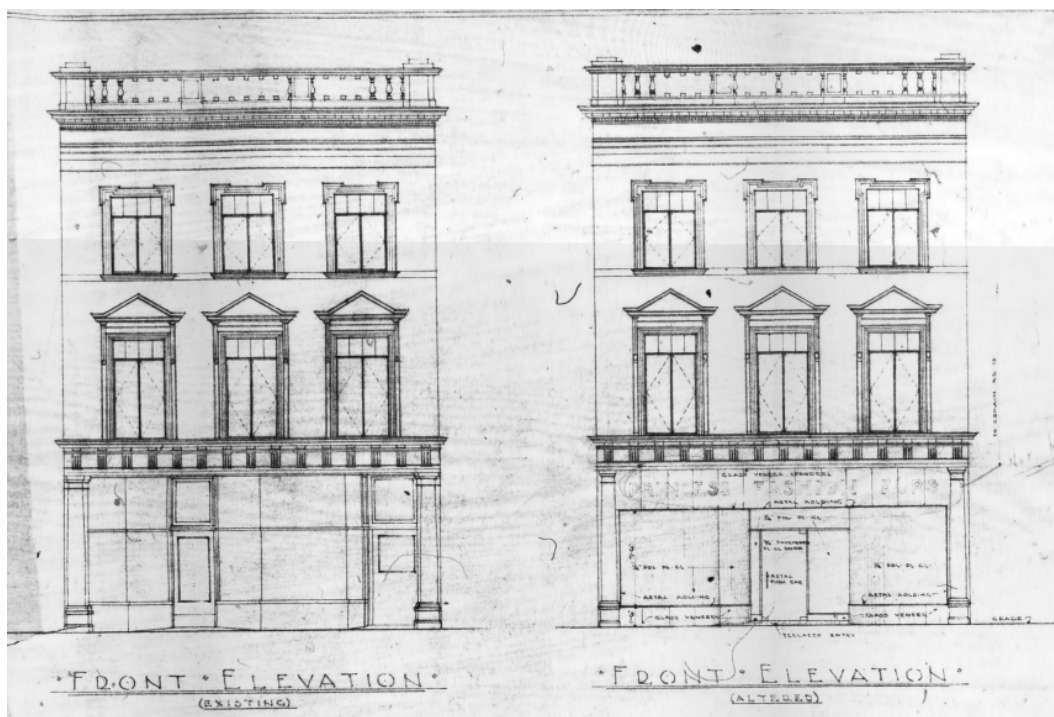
Building Records from 1946 for 750 Yonge Street, illustrating the ground floor alterations that combined the two storefronts into one, according to designs by the architect Benjamin Swartz. Elevation also shows the building's original parapet.
